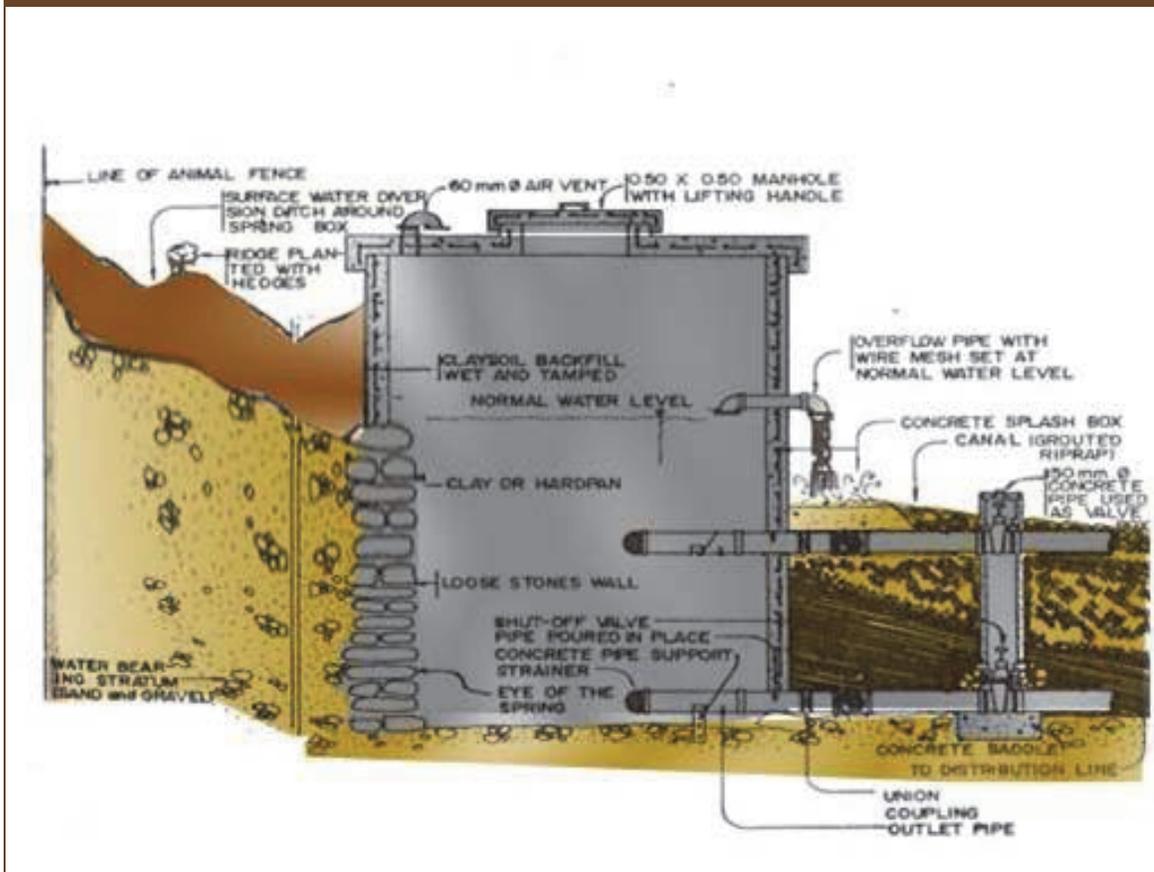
shows a typical concrete spring box. The spring box stores spring water and protects it from contamination.
